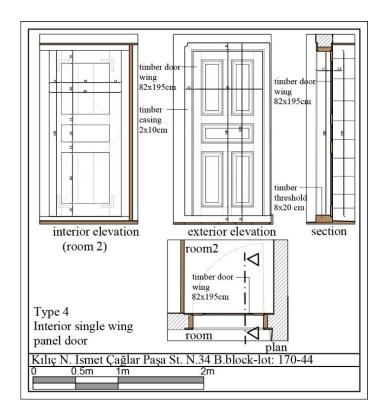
Drawing of interior single wing panel door located on timber framed wall, Type 4 (Kılıç N. b. block-lot: 170-44)
